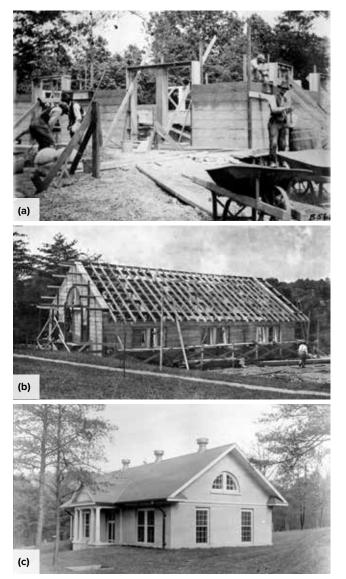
The Experimental Building built in 1919-1920 for the Department of Terrestrial Magnetism in Washington, DC: (a) during construction with concrete walls formed using Van Guilder molds and visible rolled-steel angles to maintain plumb corners (the angles were removed after the walls were completed); (b) the walls supported a wooden roof structure; and (c) after completion (photos courtesy of the Carnegie Institution for Science, Department of Terrestrial Magnetism Archives, Washington, DC)
